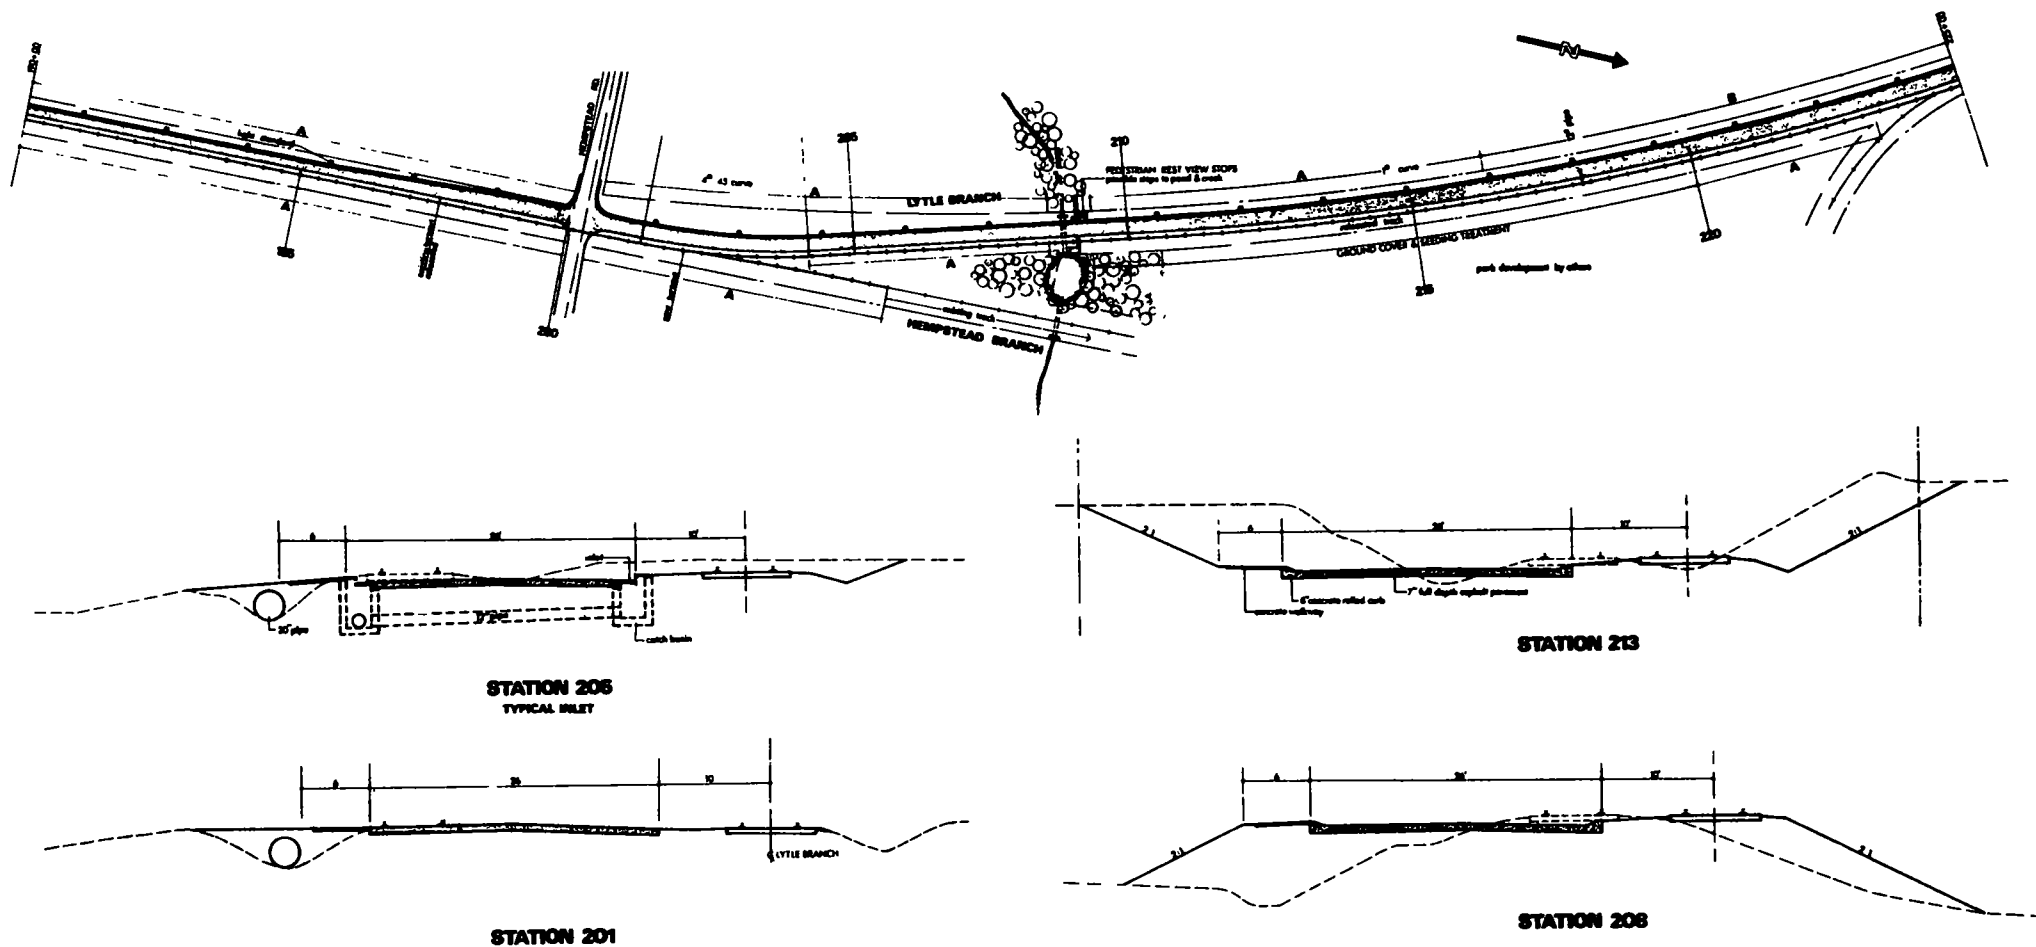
Typical cross section, Penn Central Busway, Dayton, Ohio
